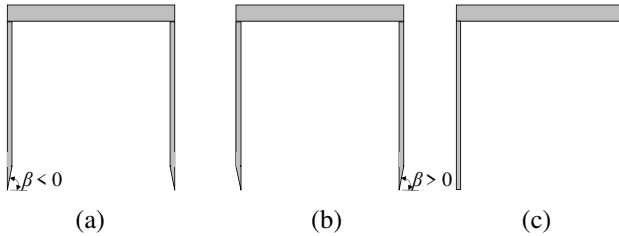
Chamfer at the skirt tip: (a) internal chamfer; (b) external chamfer; and (c) no chamfer
